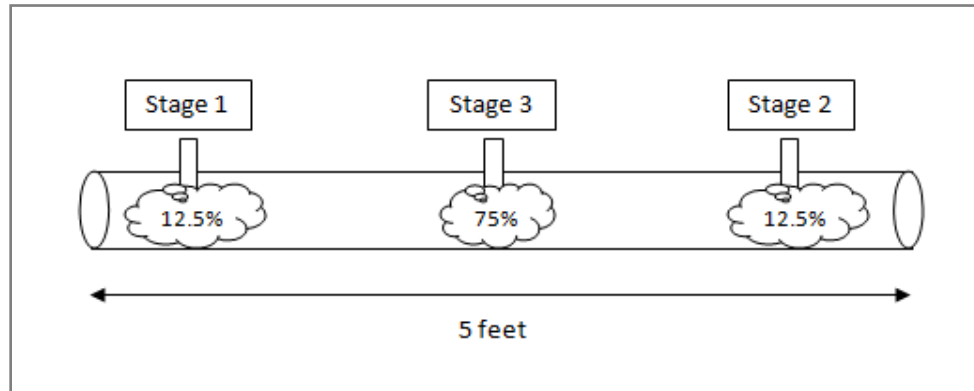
Typical stage injection of grout in a 5 feet long pipe
